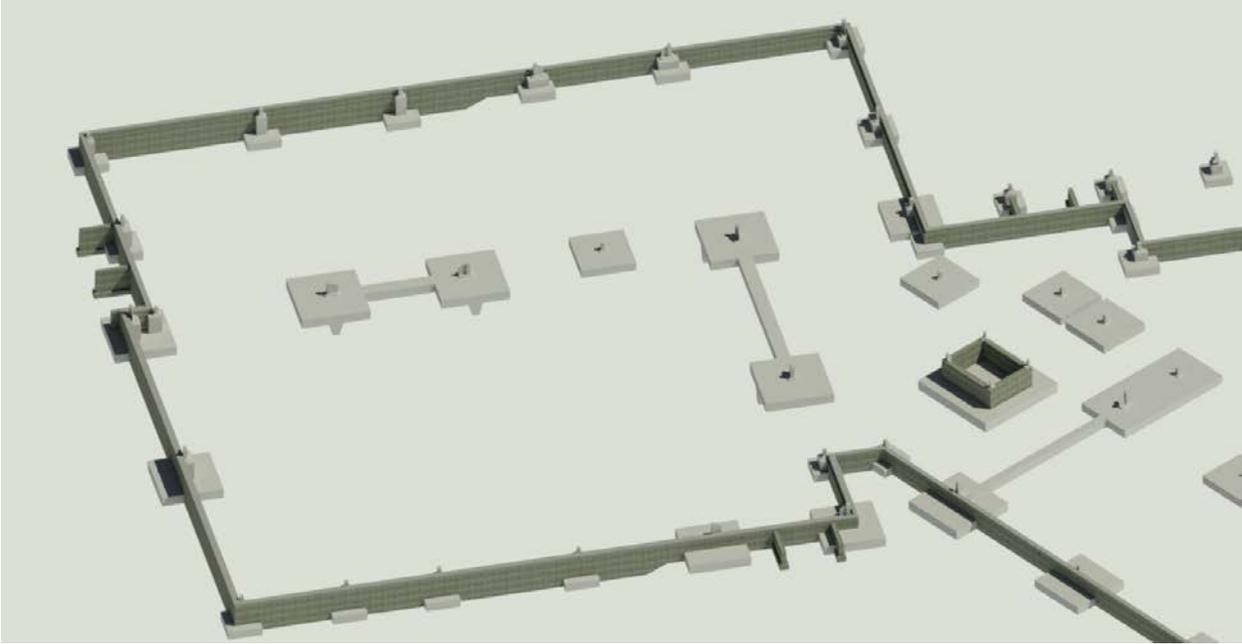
Haselden Construction – American Academy Lincoln Meadows
